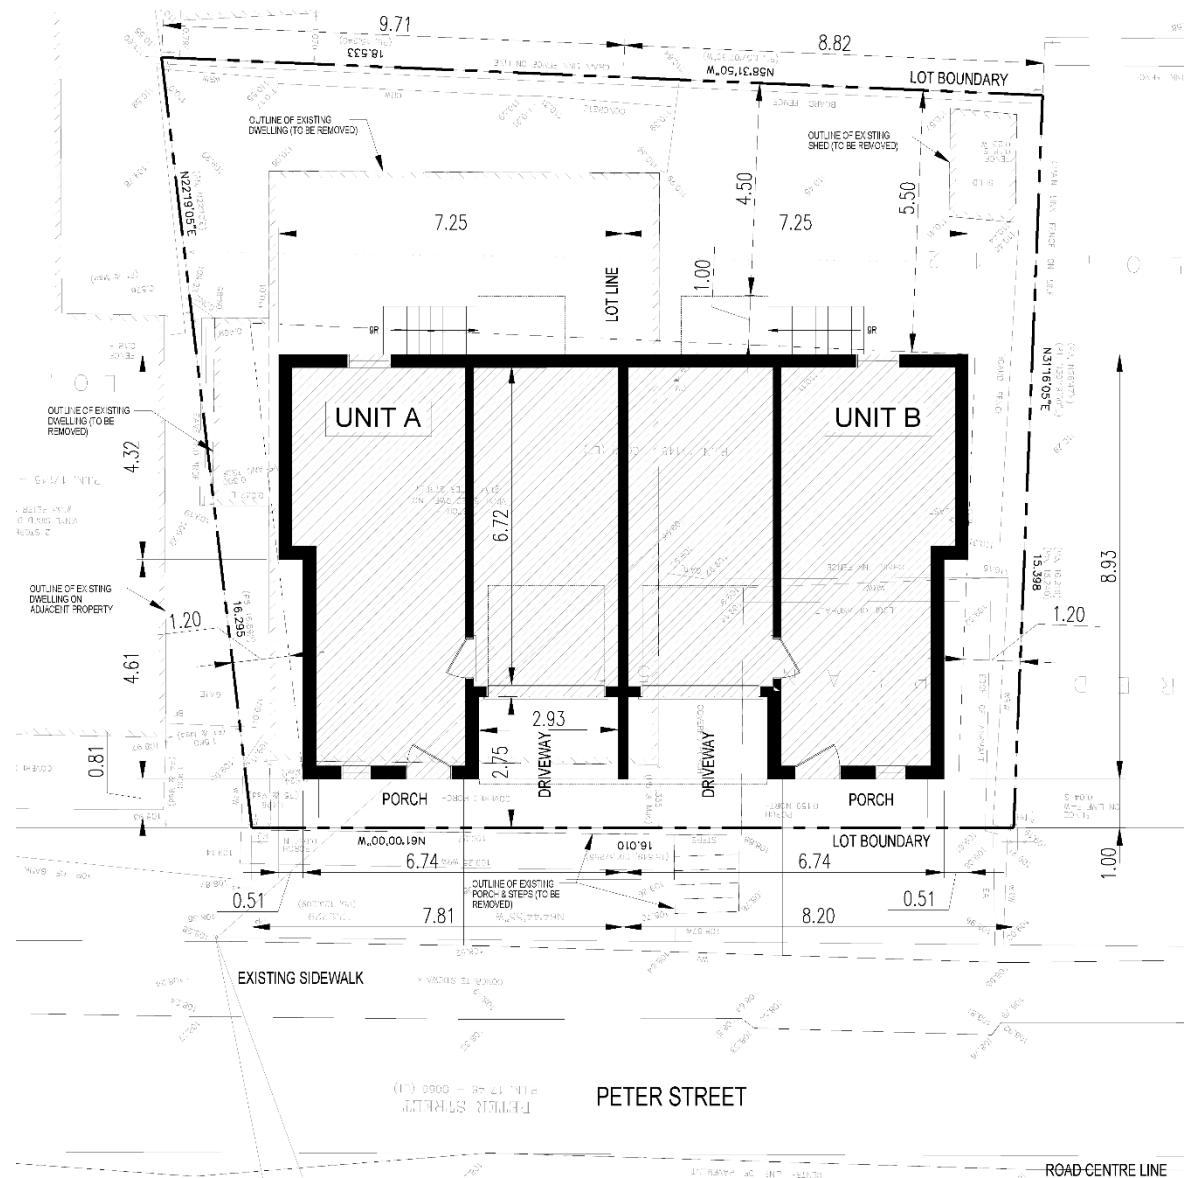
Proposed Site Plan (Source: John G. Williams Limited Architect, January 29, 2021)
